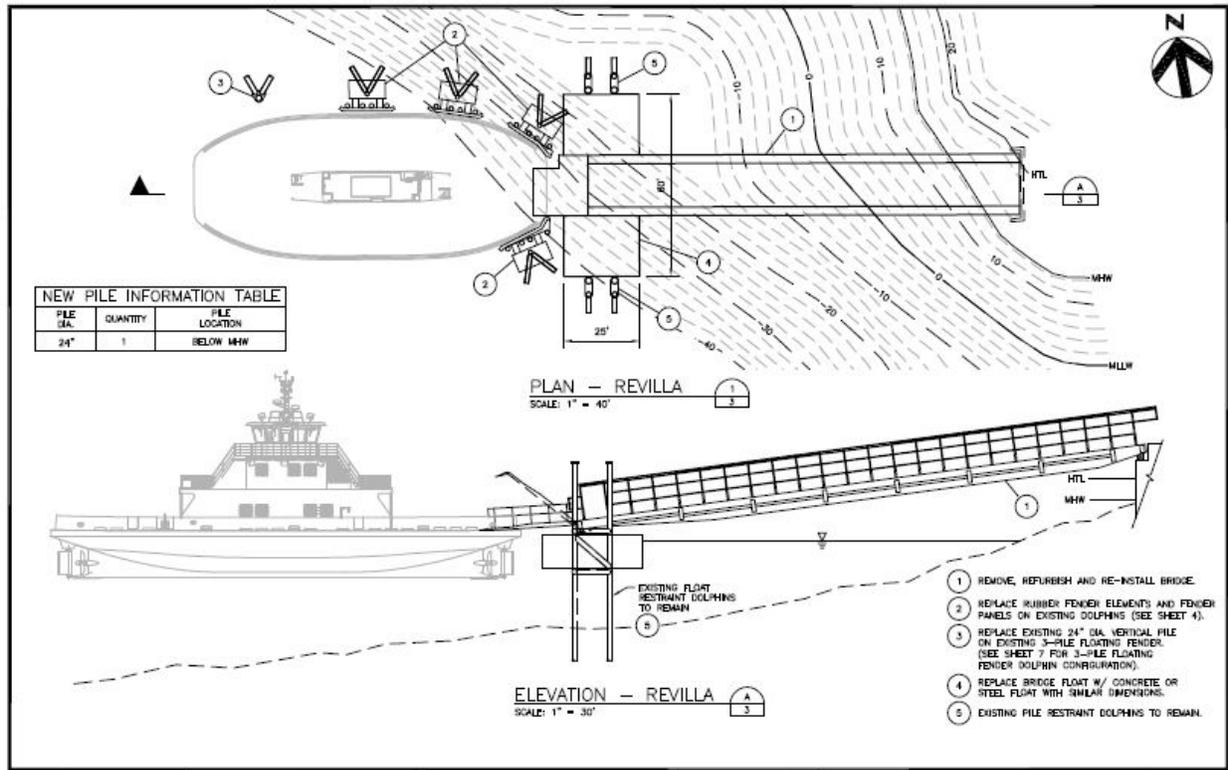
Plan drawing for refurbishment of existing Revillagigedo Island Ferry Berth (Phase 2, Component 1)(HDR 2018b).
